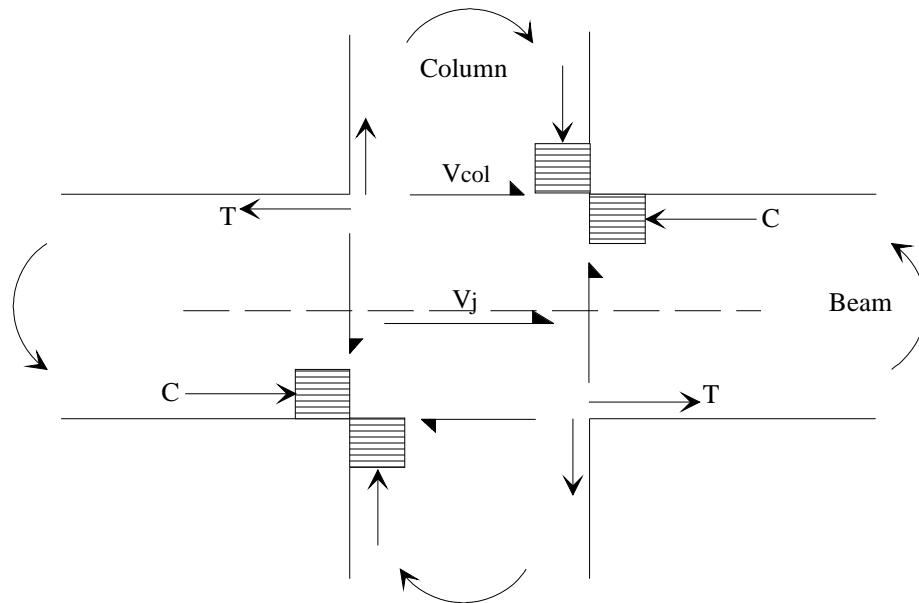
Forces Acting on the Joint of a Moment-Resisting Frame Connection
